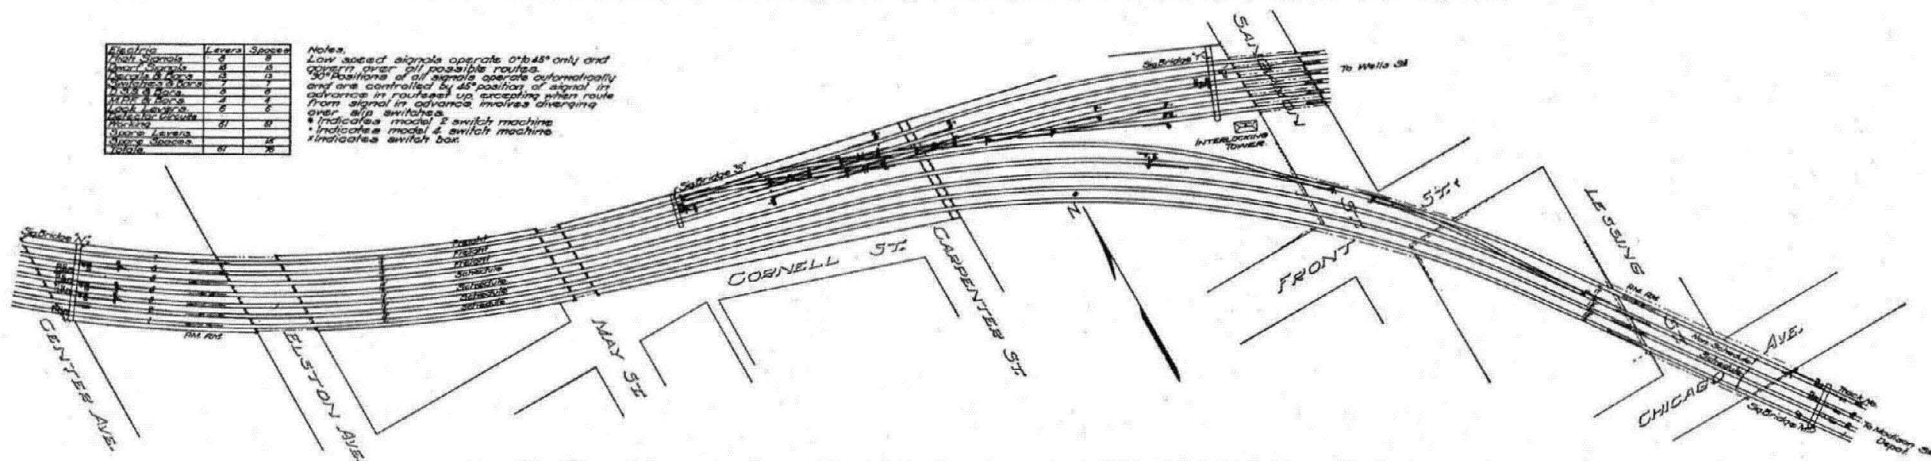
Plan of Carpenter Street Plant, Showing Junction of New and Old Tracks on North Approach.
